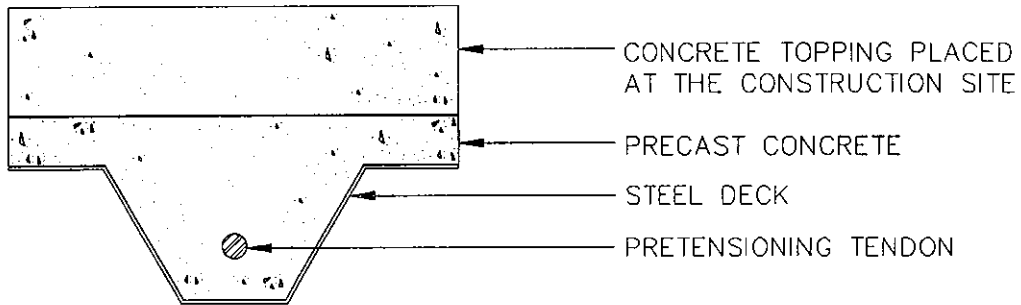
Cross section of the composite prestressed deck constructed with Bowman steel deck
